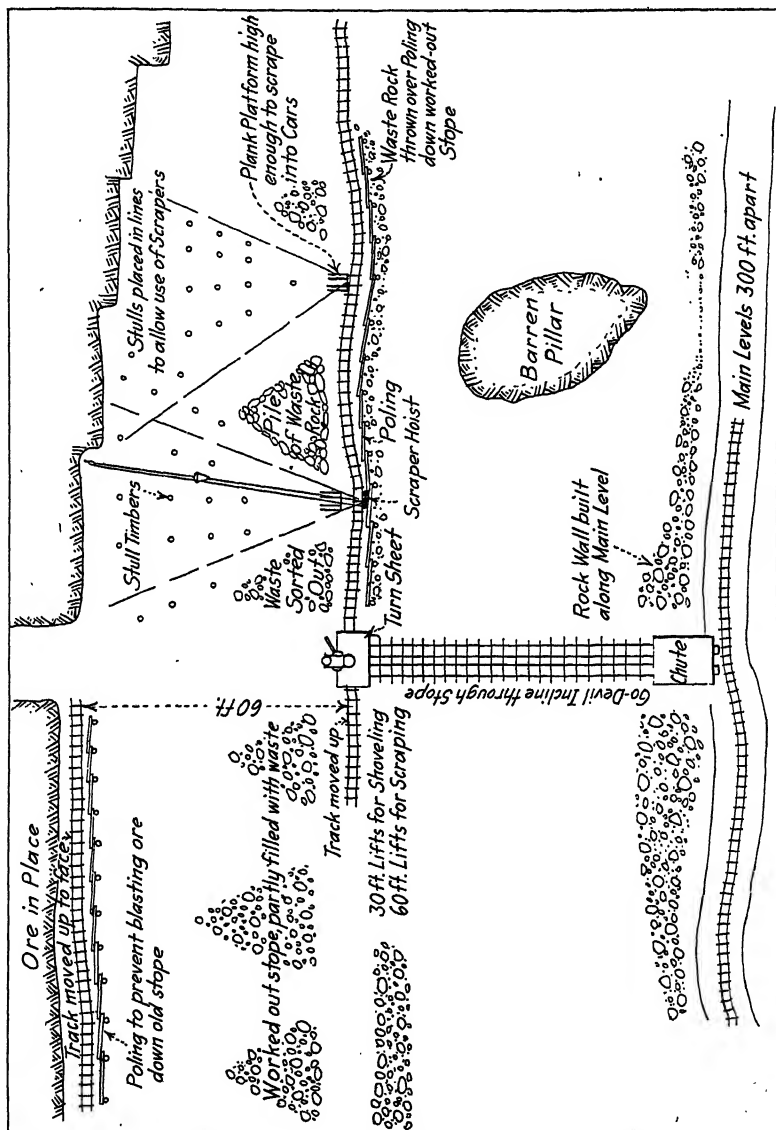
HANDLING ORE ON STOPES WITH GO-DEVIL PLANES AND SCRAPERS
